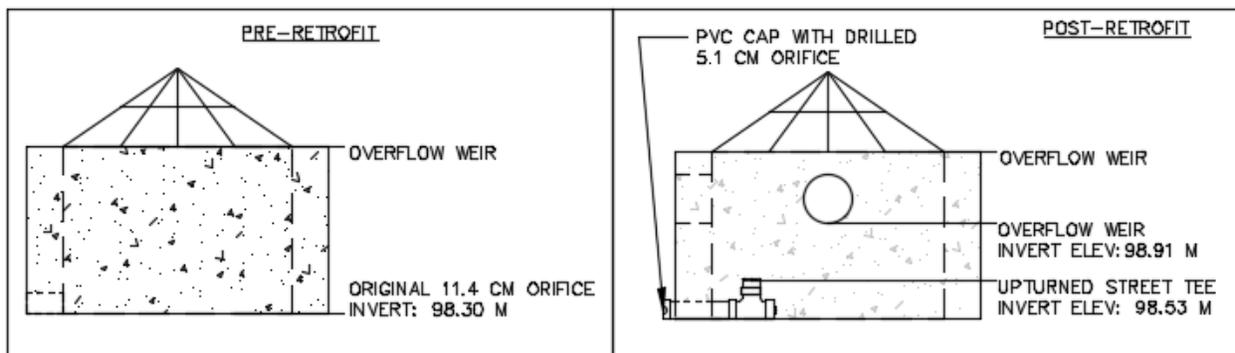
MOV1 outlet structure schematic for pre- and post-retrofit conditions. The upturned street tee set the permanent pool elevation in the converted pond.
